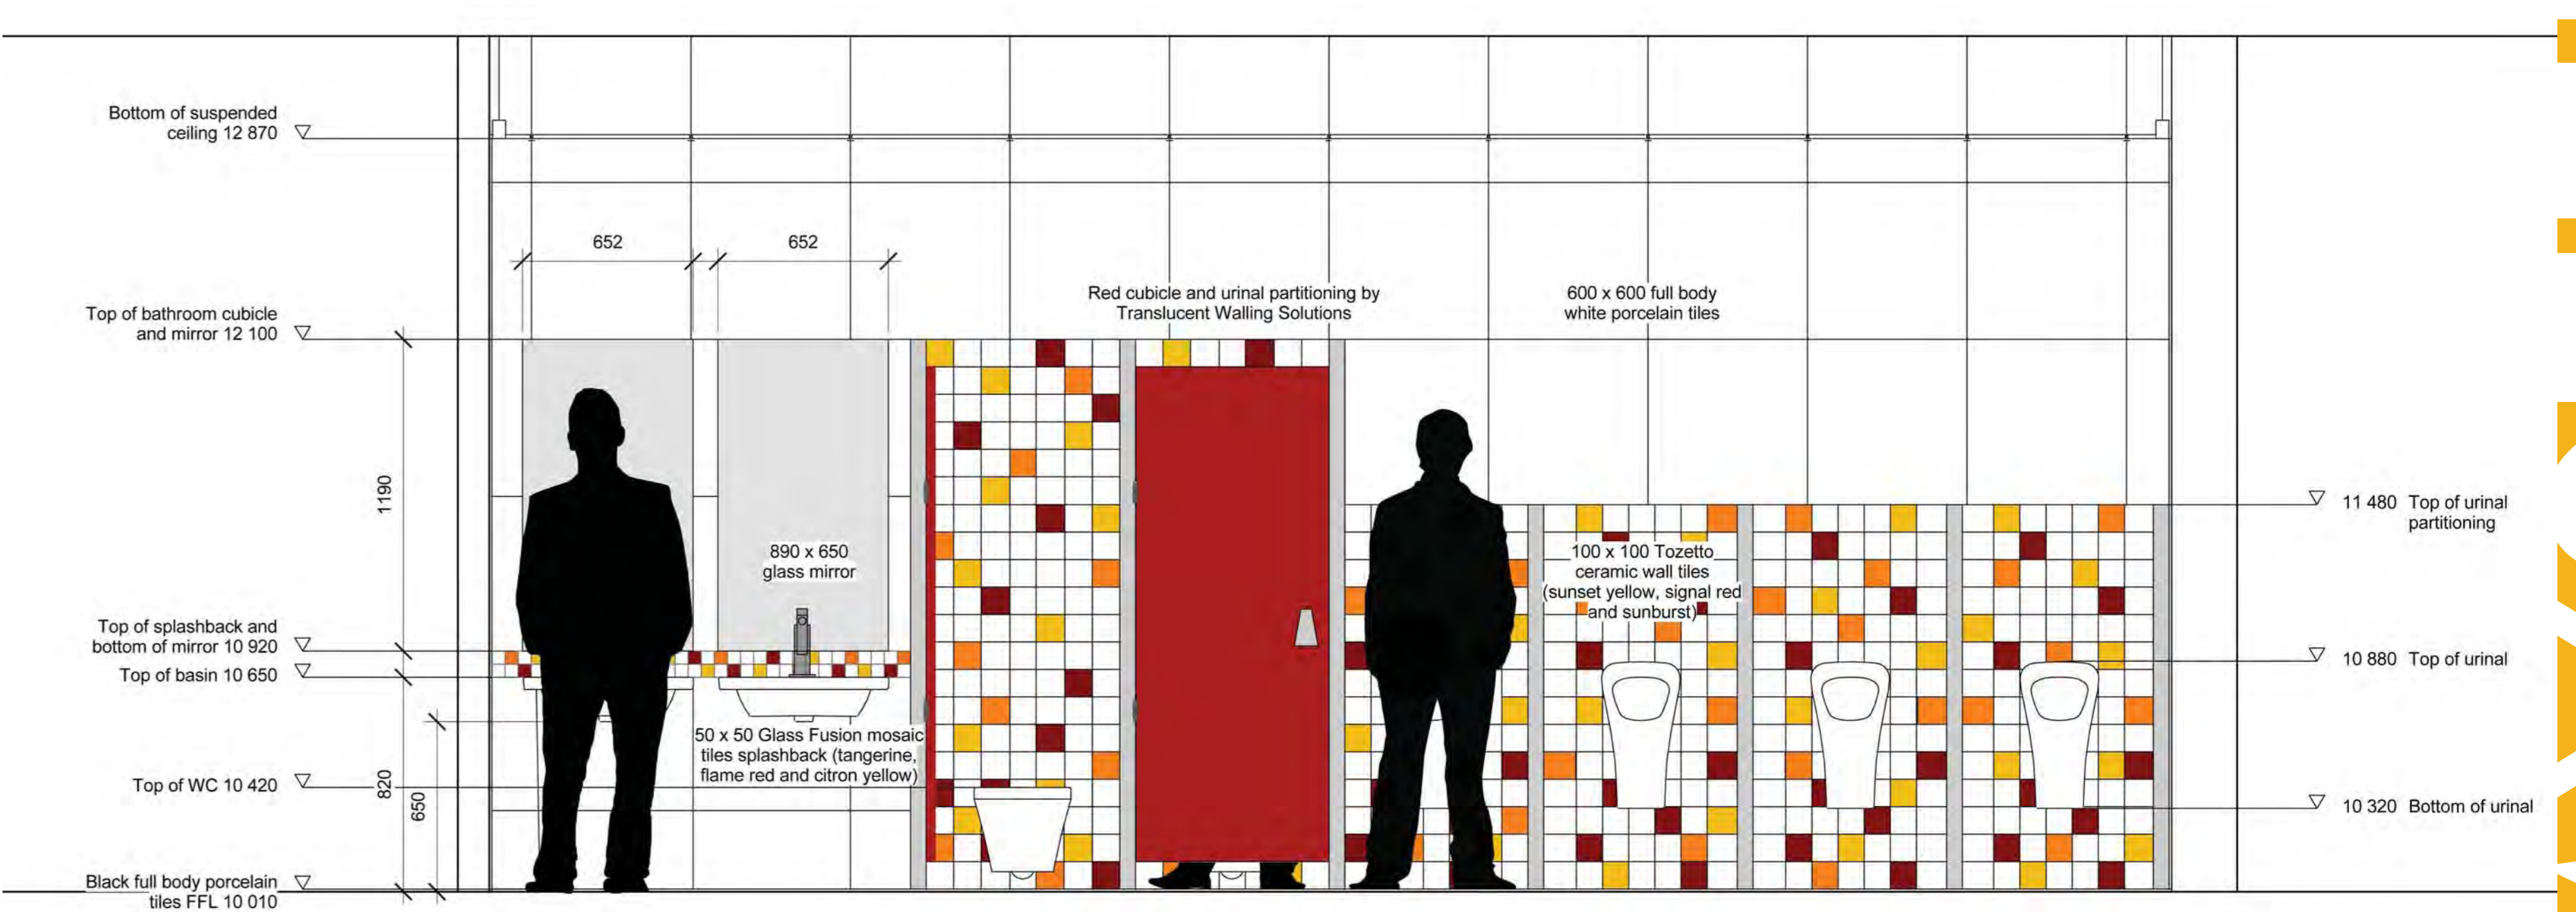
Sectional elevation illustrating a typical basin, wc cubicle and urinal wall tile layout Scale 1:20
